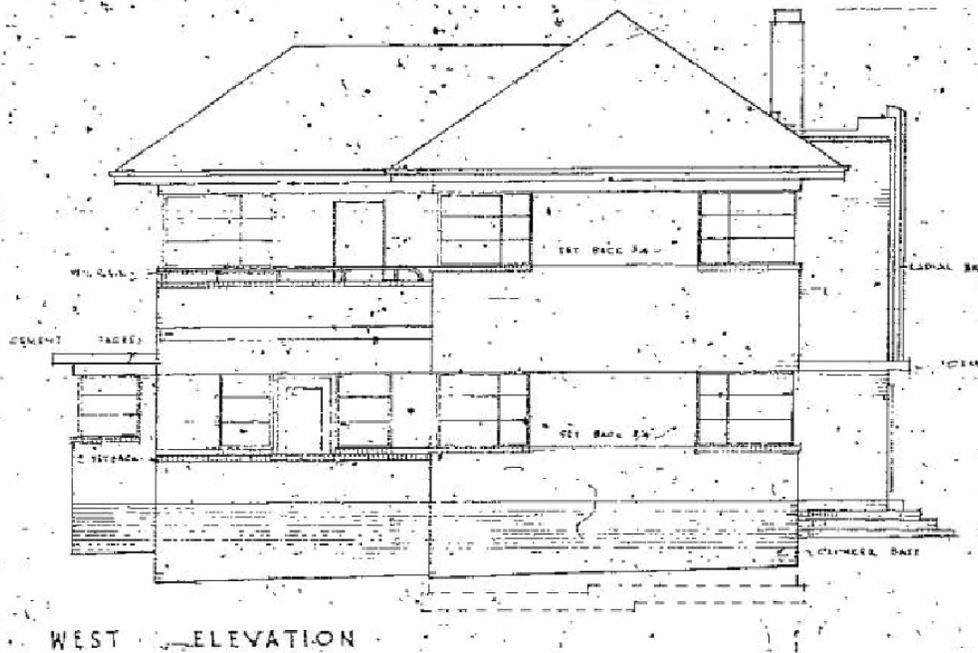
The west elevation, facing Narrak Road from the original house plans. (Source: City of Boroondara Building Permit 10142, dated 11 August 1938)
